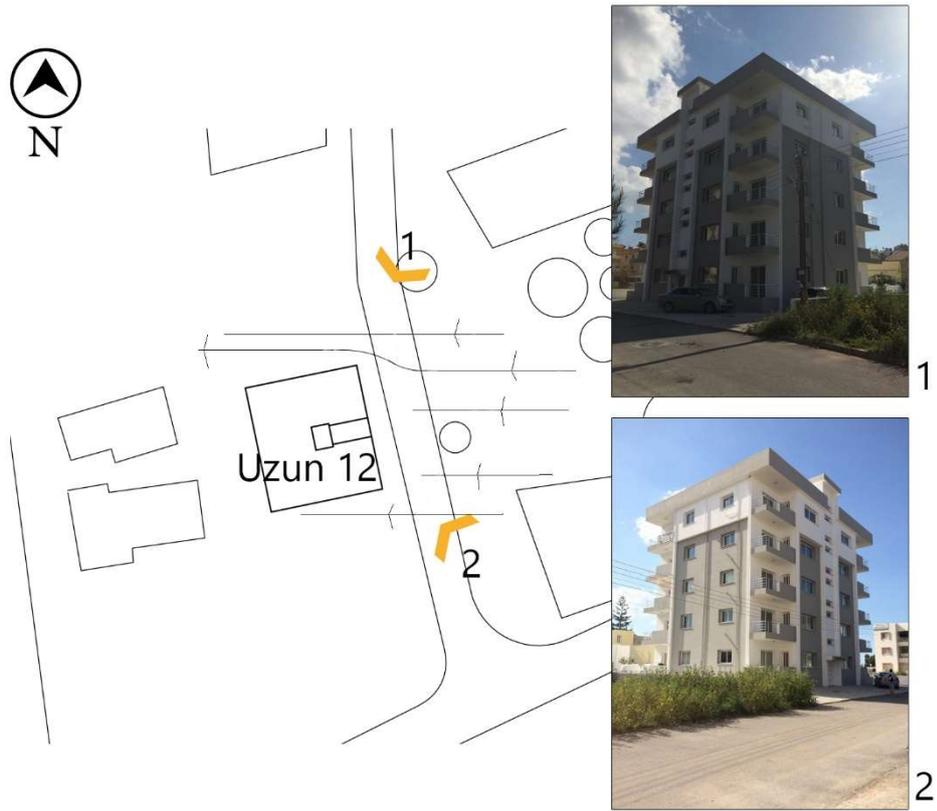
Wind pattern, solar shadows and roof type for Uzun 12 apartment. (By author, 2015)
